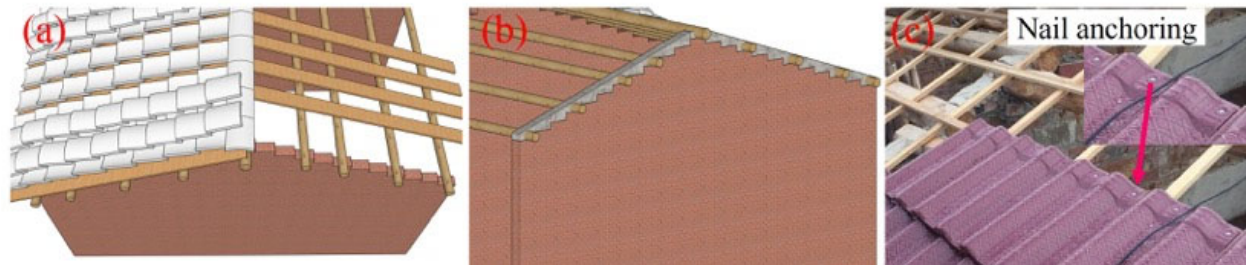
Reinforcement methods for the wooden roof. (a) Traditional wooden roof with directly laid rafters. (b) Anchorage of wooden frame support ends. (c) Replacement of traditional tiles with fixable new-type tiles.
